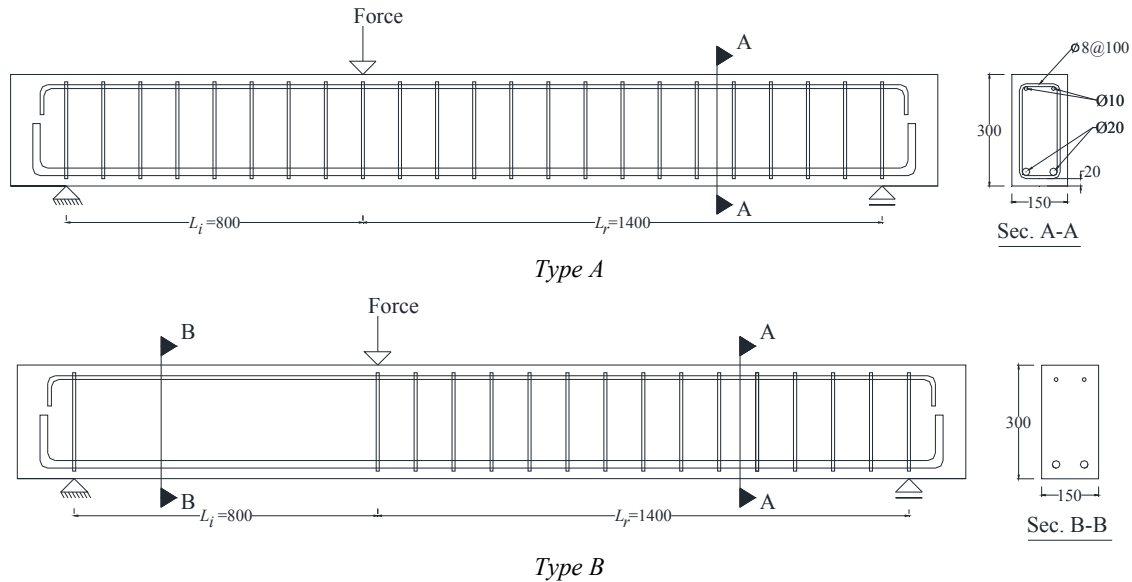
Geometry and reinforcement arrangement of the concrete beams (dimensions in mm)
